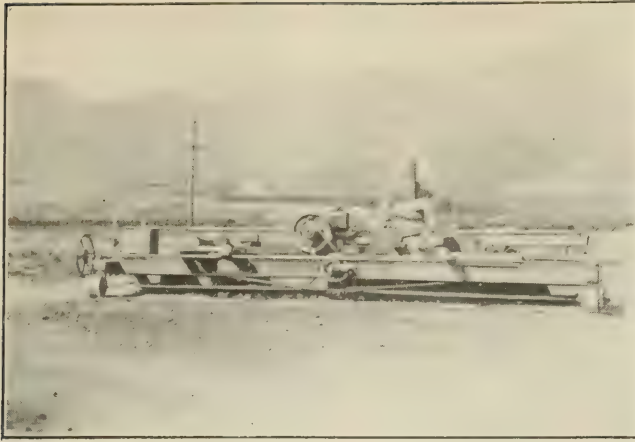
CARR'S MECHANICAL TAMPER, USED FOR FINISHING 10 MILES OF CONCRETE ROAD
